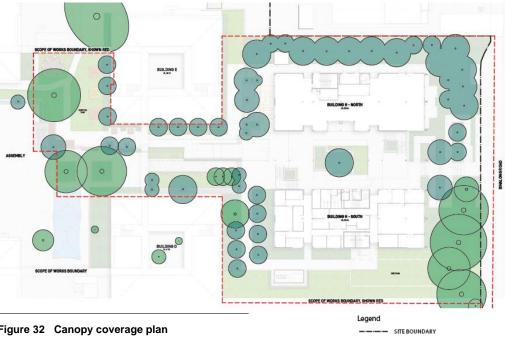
Canopy coverage plan Source: Ground Ink Landscape Architects
